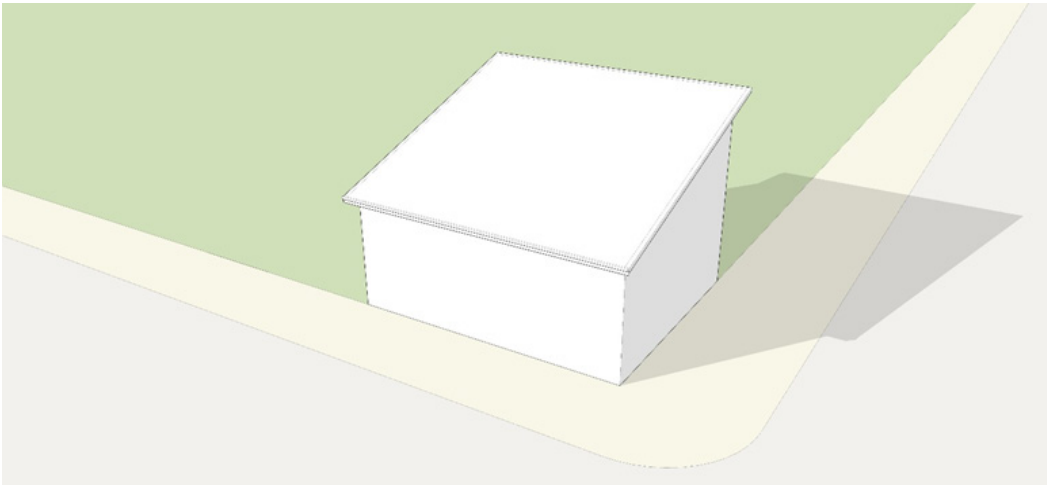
Building Stepback on Side Streets with Alleys
